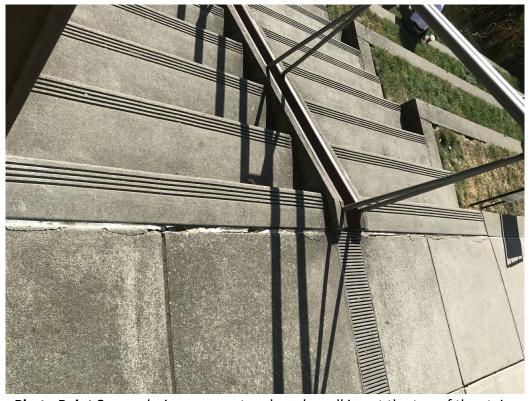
cracks in pavement and work caulking at the top of the stairs
